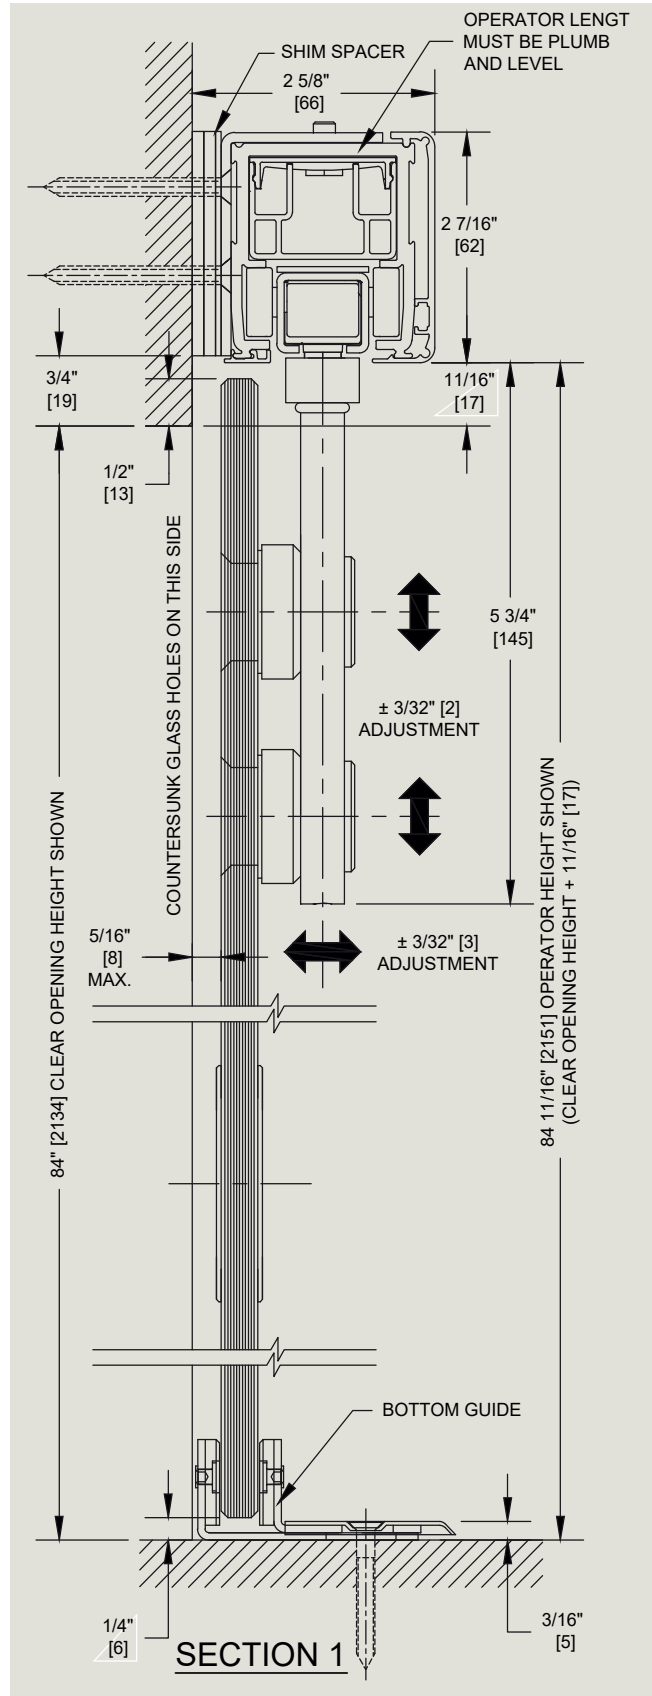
MAGNEO FIXED PANEL MOUNTS - Left hand slide open door, Optional recessed door grip
